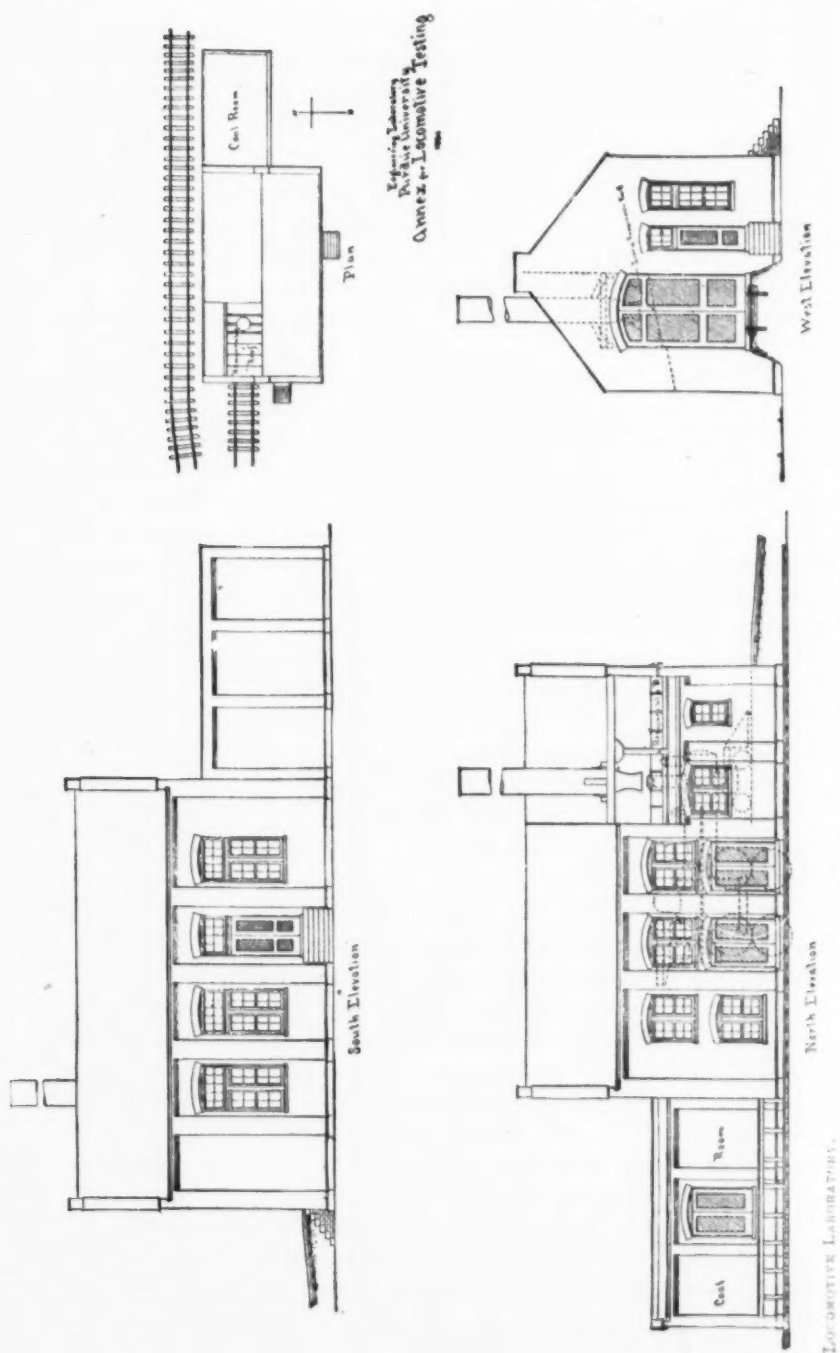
EXTERIOR OF SECOND PURDUE PLANT.
